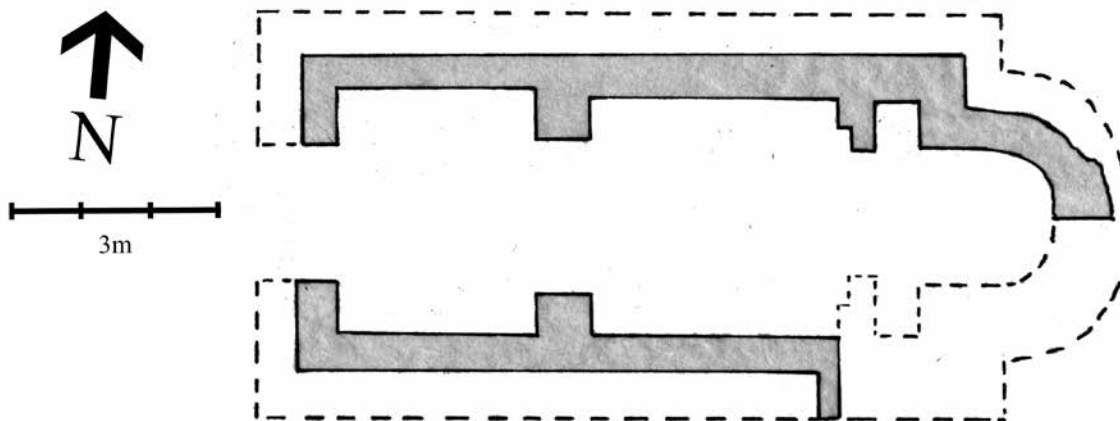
Church ground plan on the Gradac site near Krepoljin (current condition) (drawing: M. Milovanović).
